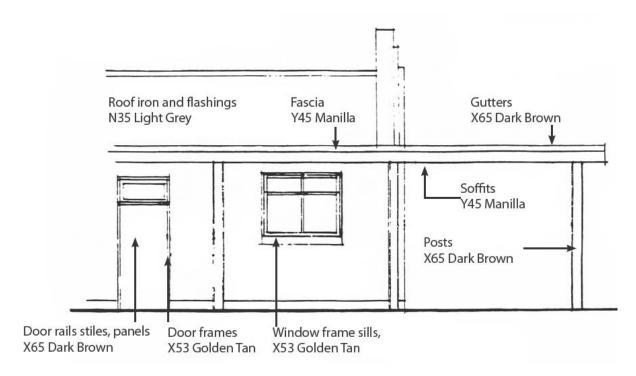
Island Platform Buildings - Masonry (post 1935 design)
